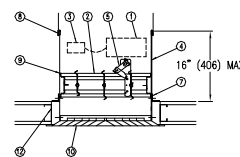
ACTUATOR ABOVE DAMPER WITH FLAT-FRAME DIFFUSER
